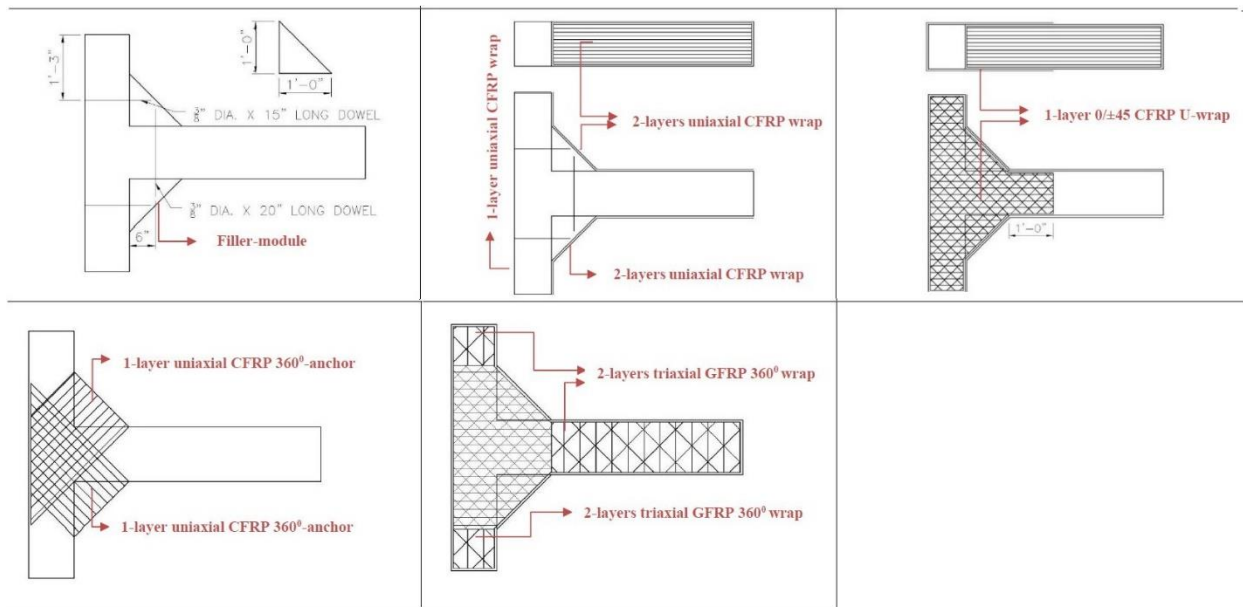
Schematics of the strengthening scheme used on specimen JI-4 (Majjigapu 2020)
